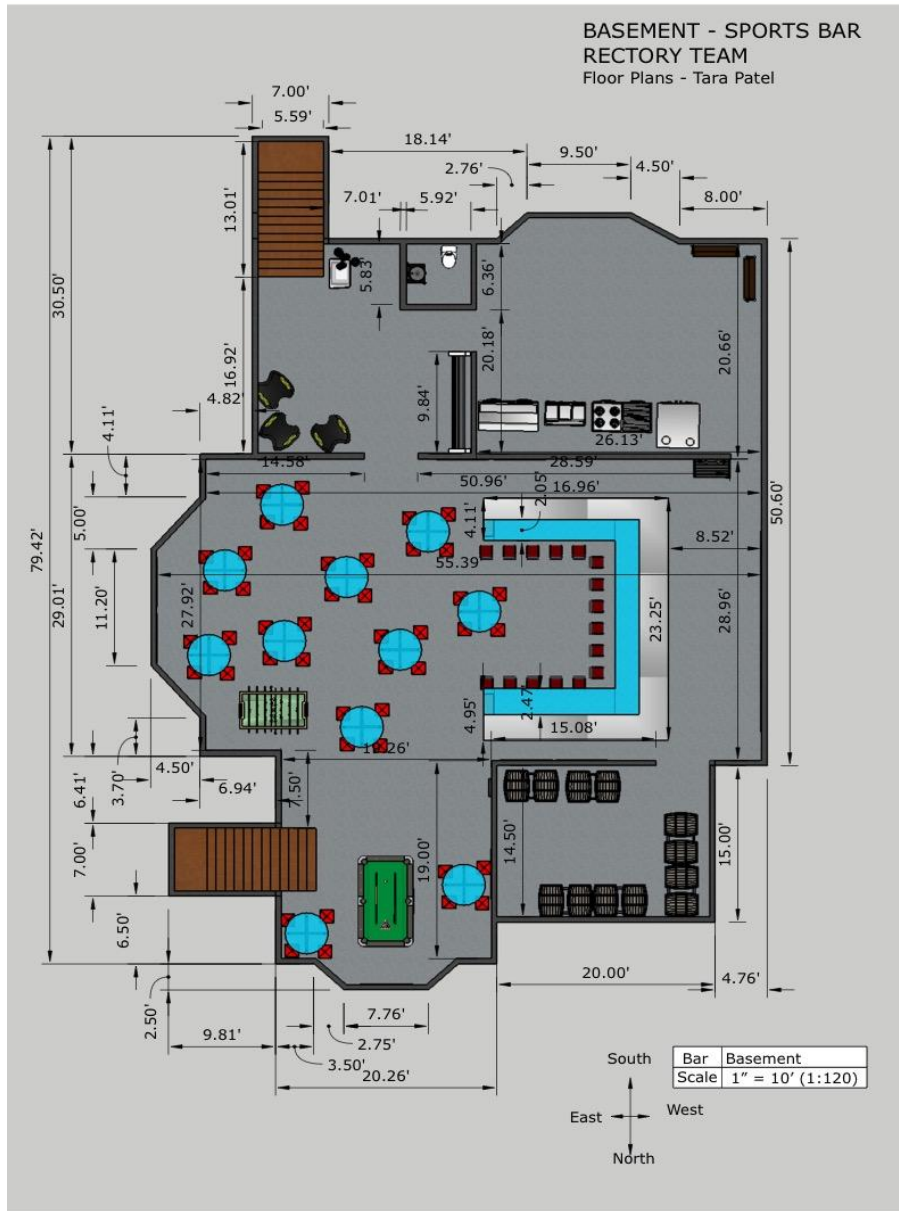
Floor plans of the basement/bar with two exits on the east (left) and south (rear) sides. The east (left) half features the main entrance/exit, a lobby/coat area, a unisex bathroom, additional tables along with wall mounted televisions, a pool table, a foosball play table, and darts for entertainment. The west (right) side consists of the kitchen/food prep/pantry area with the mechanical/electrical equipment, the bar with seating along it, and a storage room for liquor and beer.
